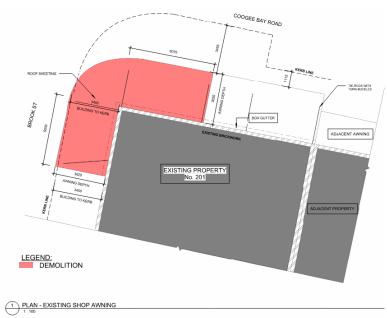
The section of the existing awning (shaded red) located on the corner of Brook Street and Coogee Bay Road that is proposed to be replaced.
